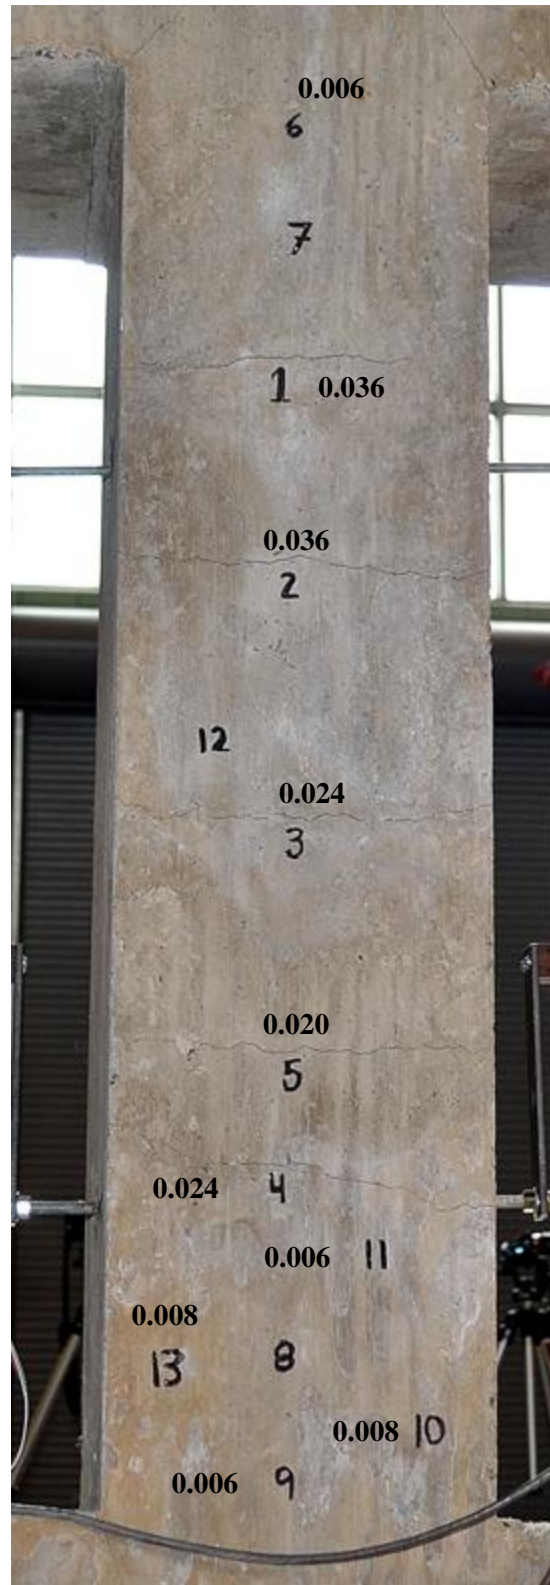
Cracks on east face of TS01 at Load Step 21
